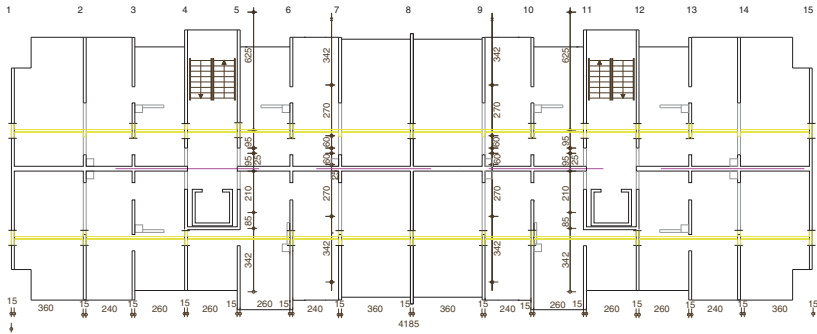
Typical multistory R.C. walls building (Groundfloor + seven/eight stories), regular structure
